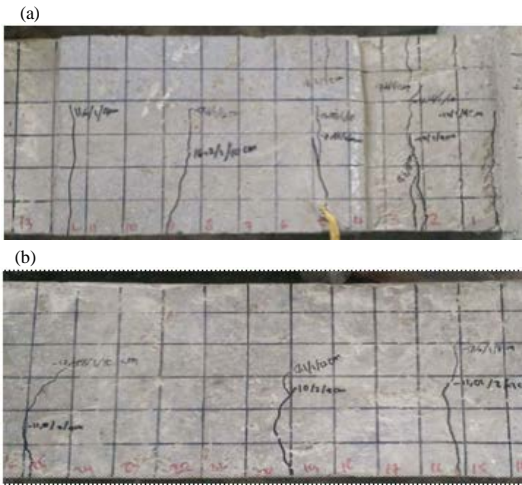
, b): The cracks on plastic hinge area (BTK 30)
